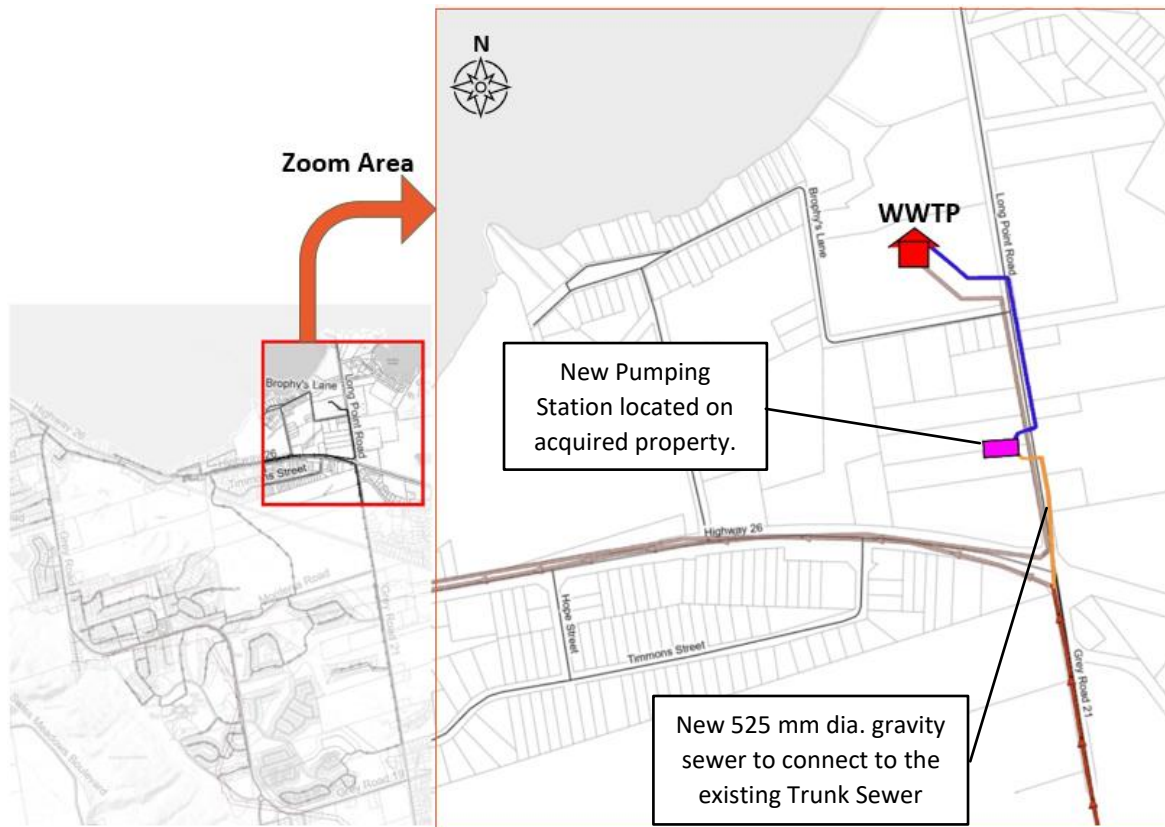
Alternative D – New Pumping Station between Hwy 26 and Craigleith WWTP Site
